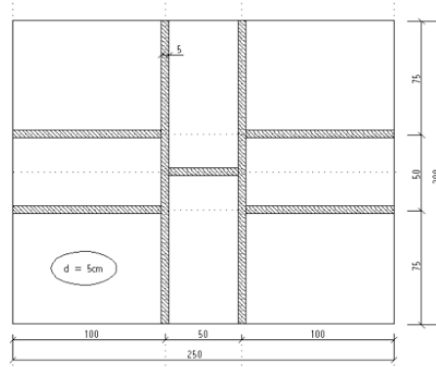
Experimental tunnel form building model plan (dimensions: 200 × 250 cm²), (Wall and floor thickness are 20 and 5 cm, respectively).
